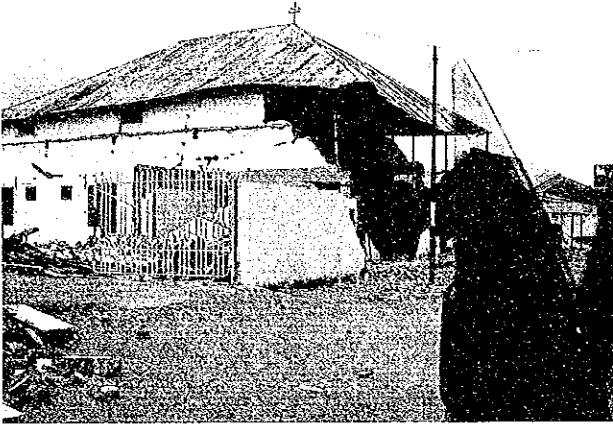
Out of Plane Collapse of Non Reinforcing Masonry Wall Structure
